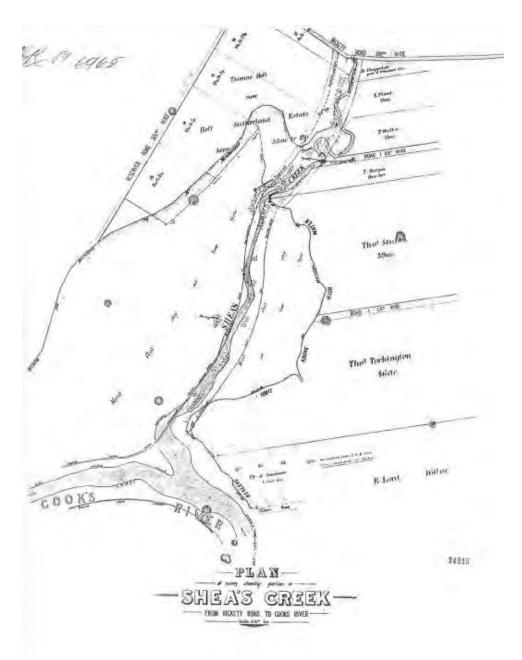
An undated plan of the Alexandra Canal by 1889 showing the Canal and fascine dyke up to Ricketty Street completed and construction beyond Ricketty Street has commenced.
